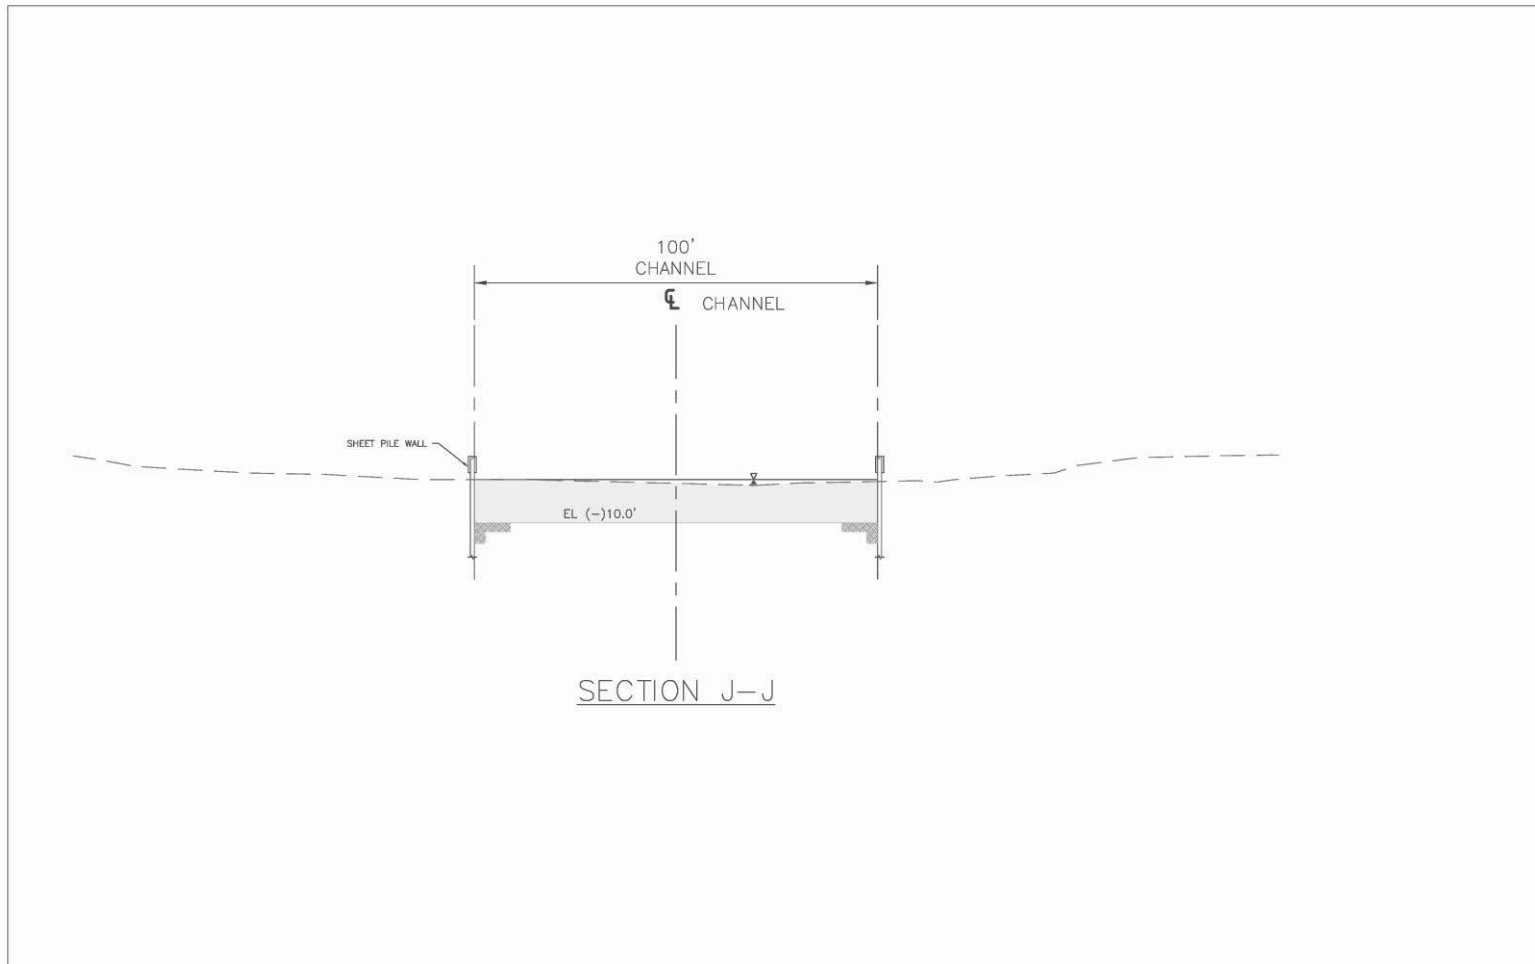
Cross Section J-J, Typical Channel above Ponce de León Avenue Bridge
